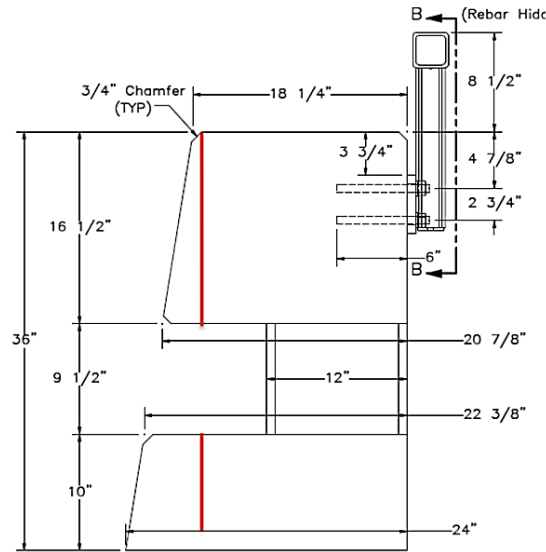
Potential Modification for Aligning Front Face of Rail and Curb
